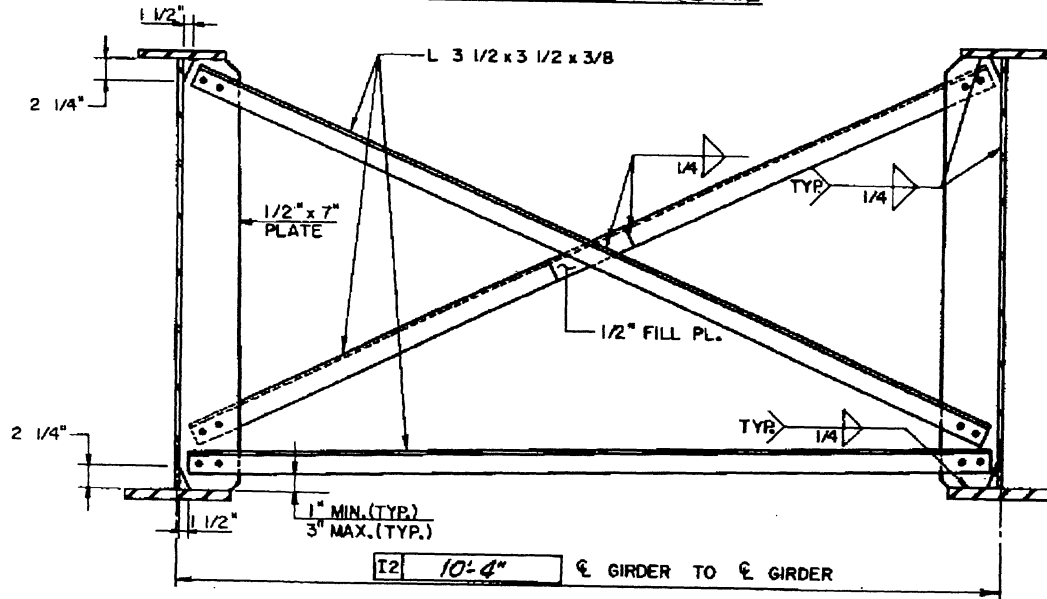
Oklahoma Miscellaneous Details for Composite I-beams and Plate Girders, 1981
